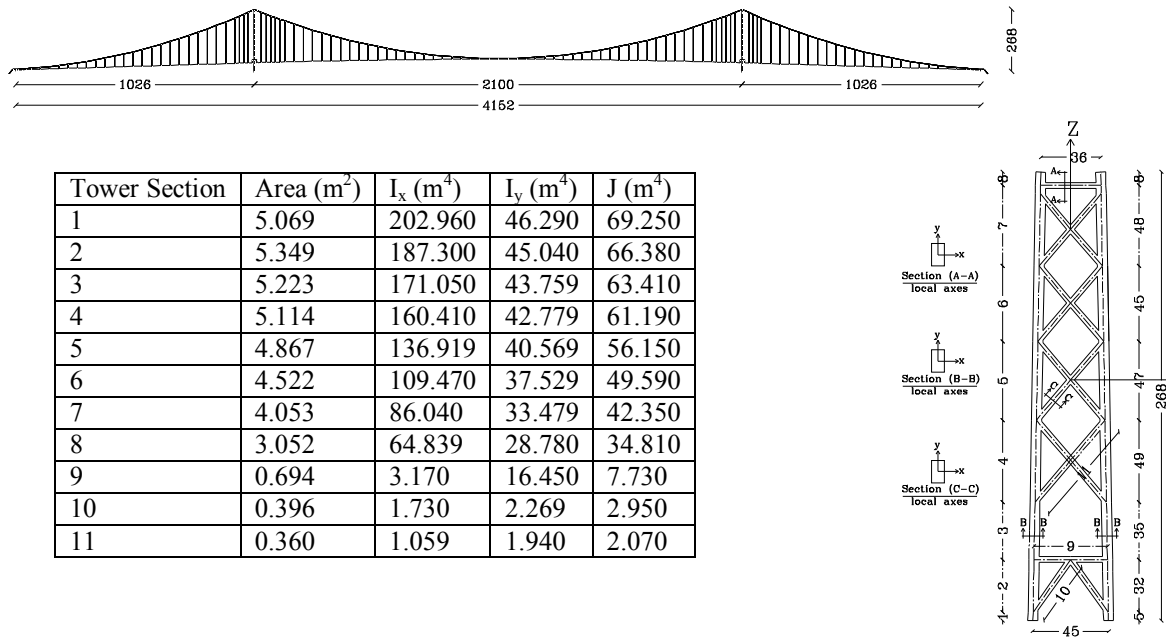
Three Spans Suspension Bridge Layout - Central Span 2100m
